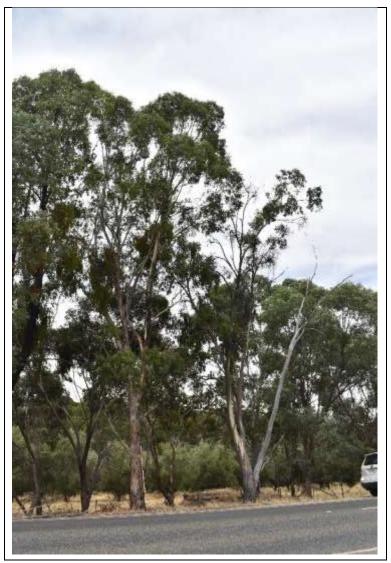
MM 180.78 LHS, ROOT PRUNE LF 0.6
